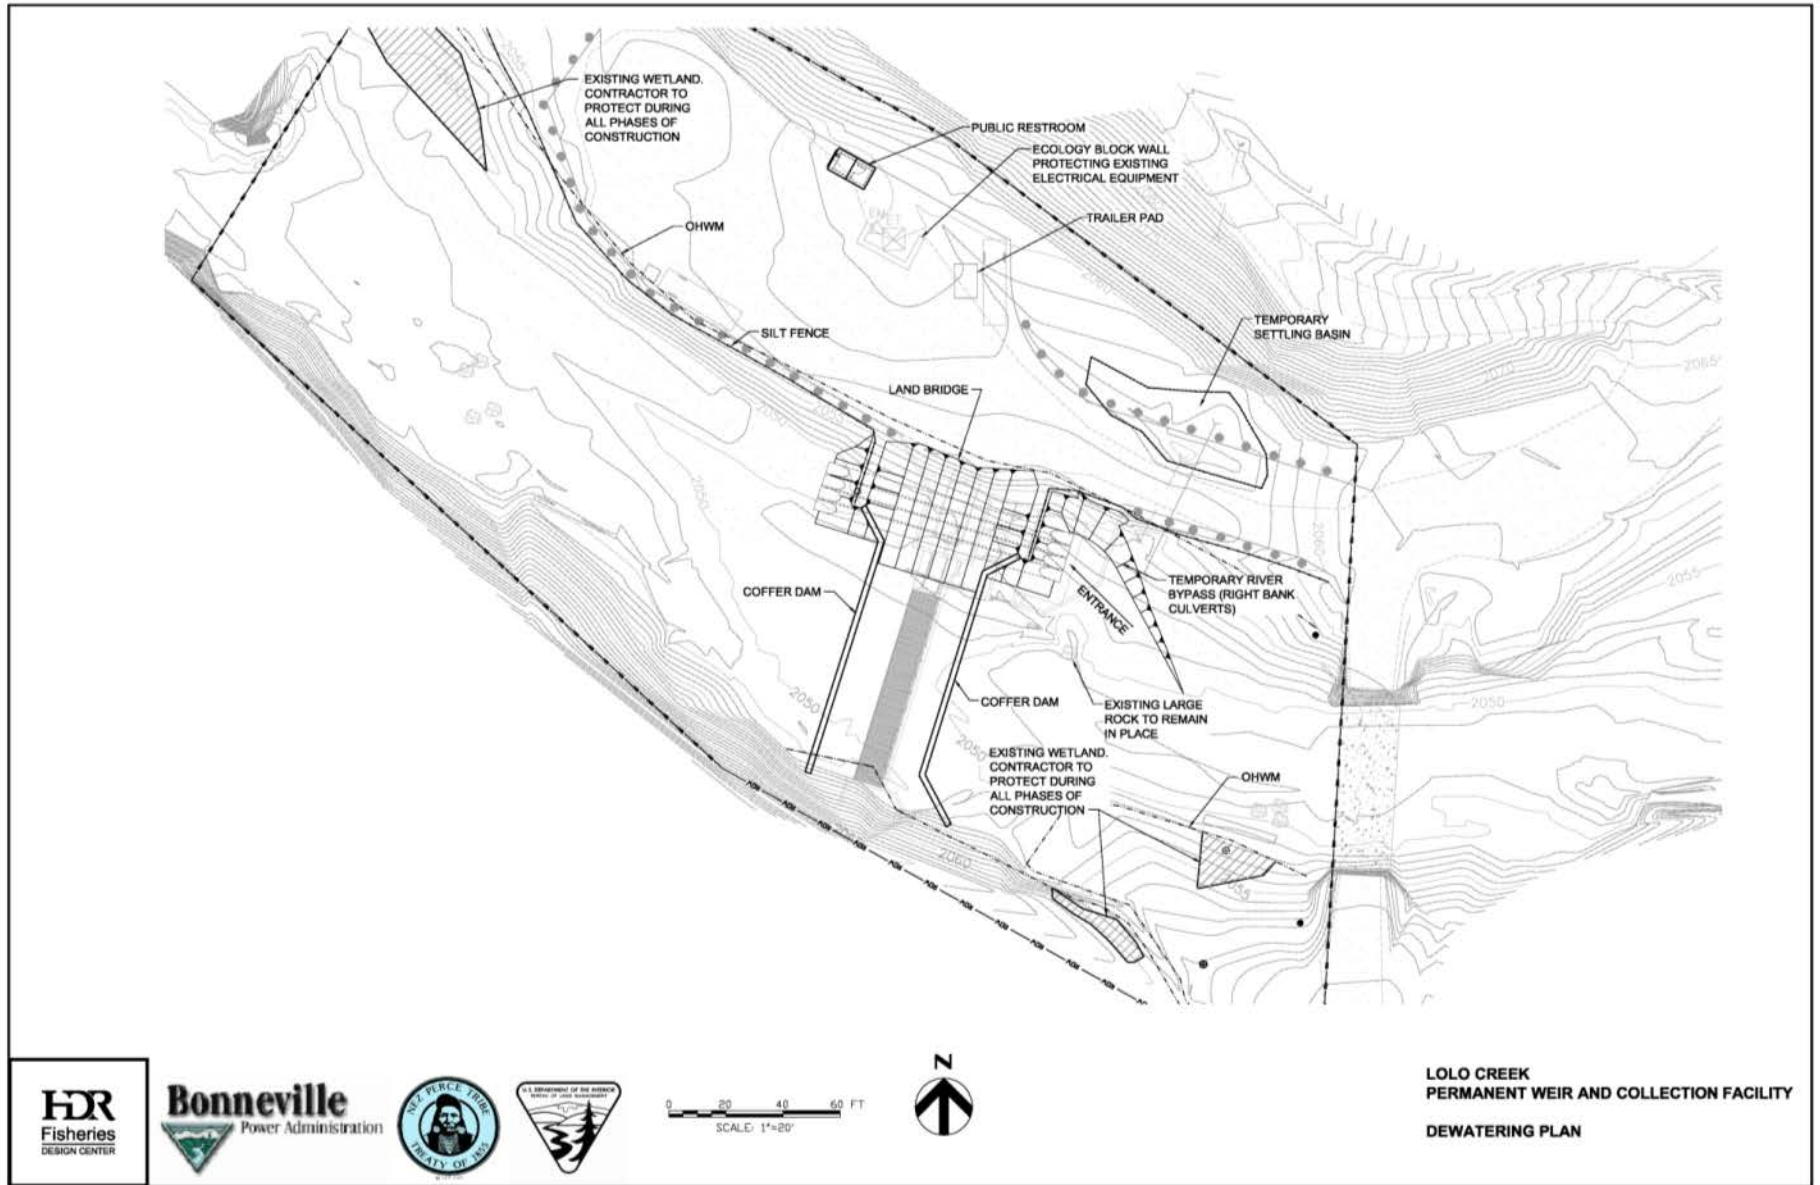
Instream Isolation Plan, Showing North Bank Culvert Bypass.
